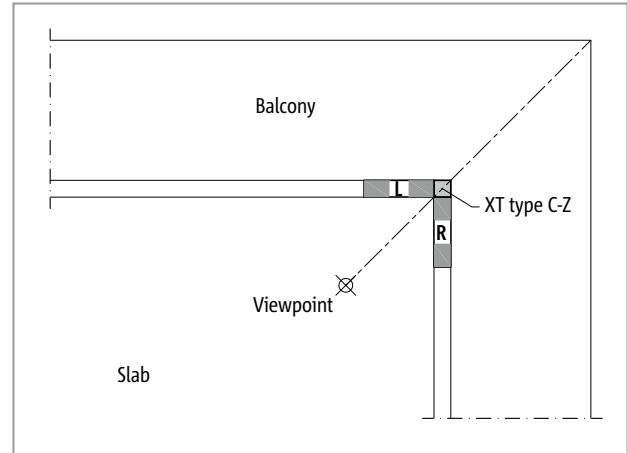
Schöck Isokorb® XT type C: Arrangement XT type C-L left from viewpoint, arrangement XT type C-R right from viewpoint
